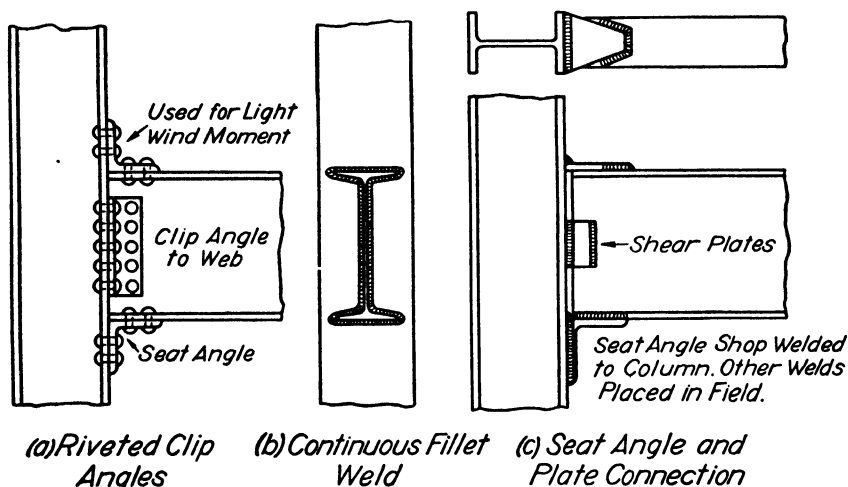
CONNECTIONS FOR BEAMS AND GIRDERS.
